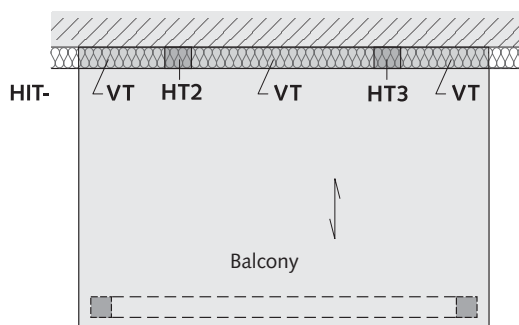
Simply supported balcony on columns. HIT-HT units are used to absorb the expected horizontal loads.
